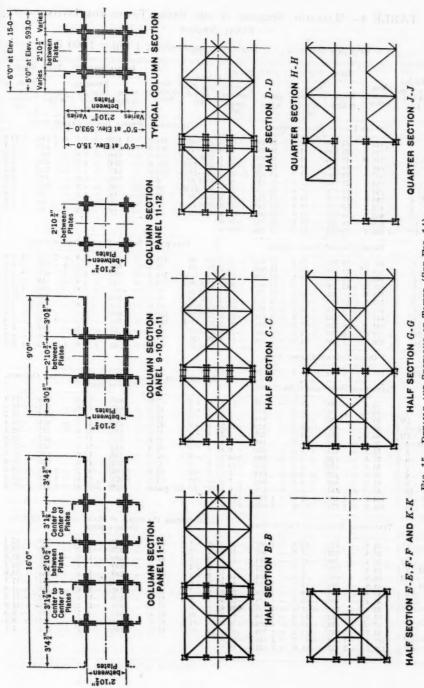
DETAILS AND SECTIONS OF TOWER (SEE FIG. 14).
